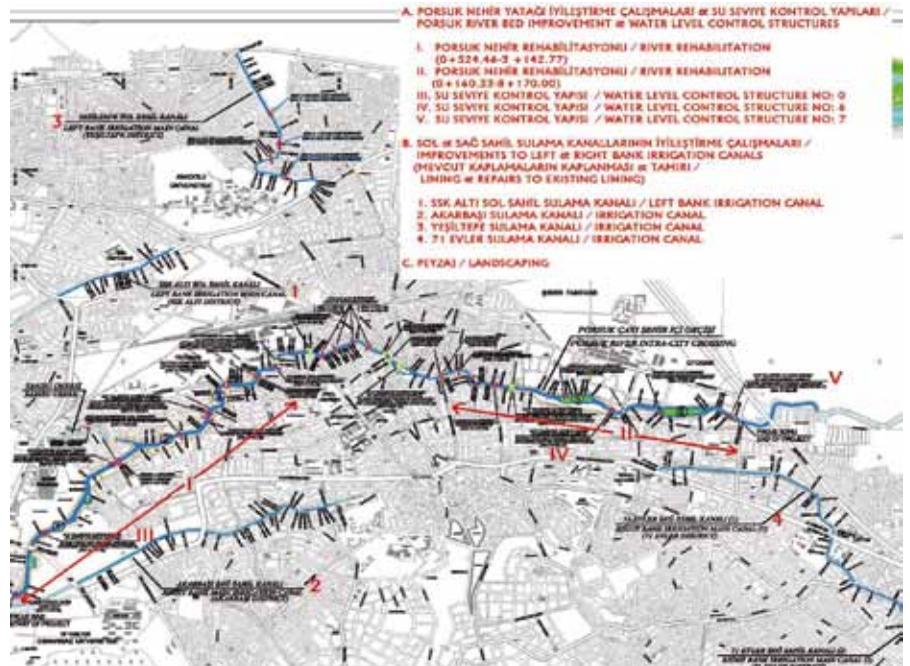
Porsuk River Project Layout Plan that Shows Porsuk River Bed Improvement, Improvements to Bank Irrigation Canals and Landscaping.
